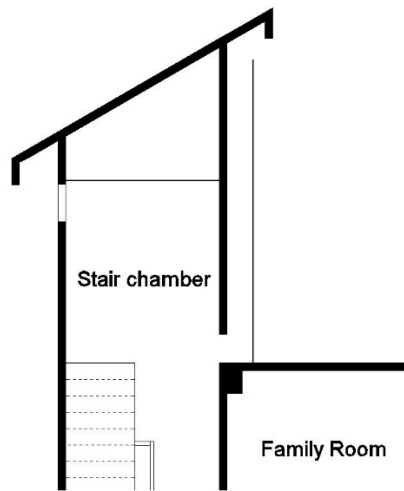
Resizing Trombe wall design and maintain the existing outlet
